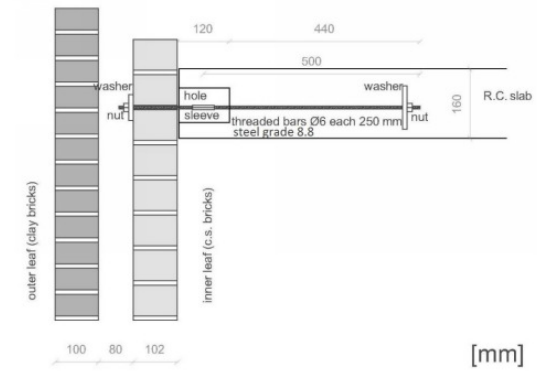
Detail of the connection between the r.c. slab of the first floor and the inner leaf (c.s. walls) - East and West side.
